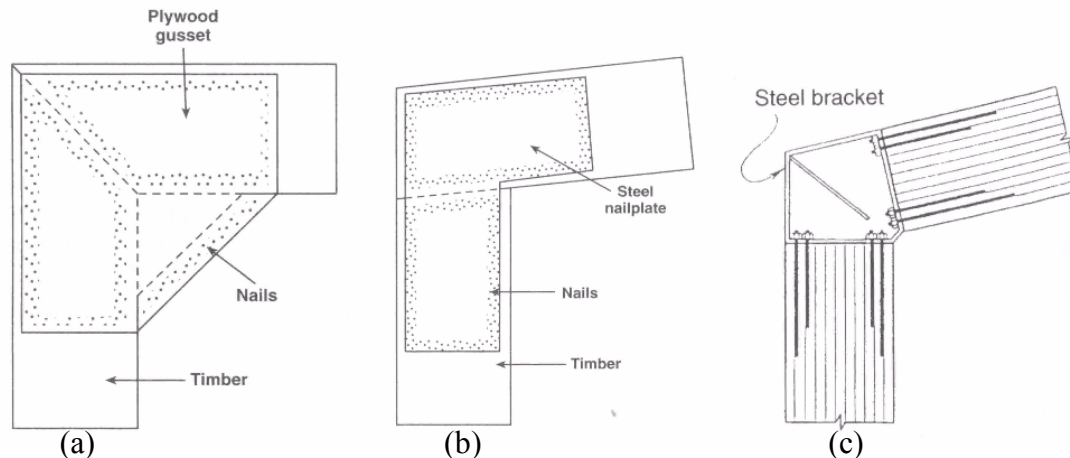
Types of portal connections: (a) plywood gusset, (b) steel nailplate, and (c) epoxy rods with steel hub. Reproduced from Buchanan (2002)
